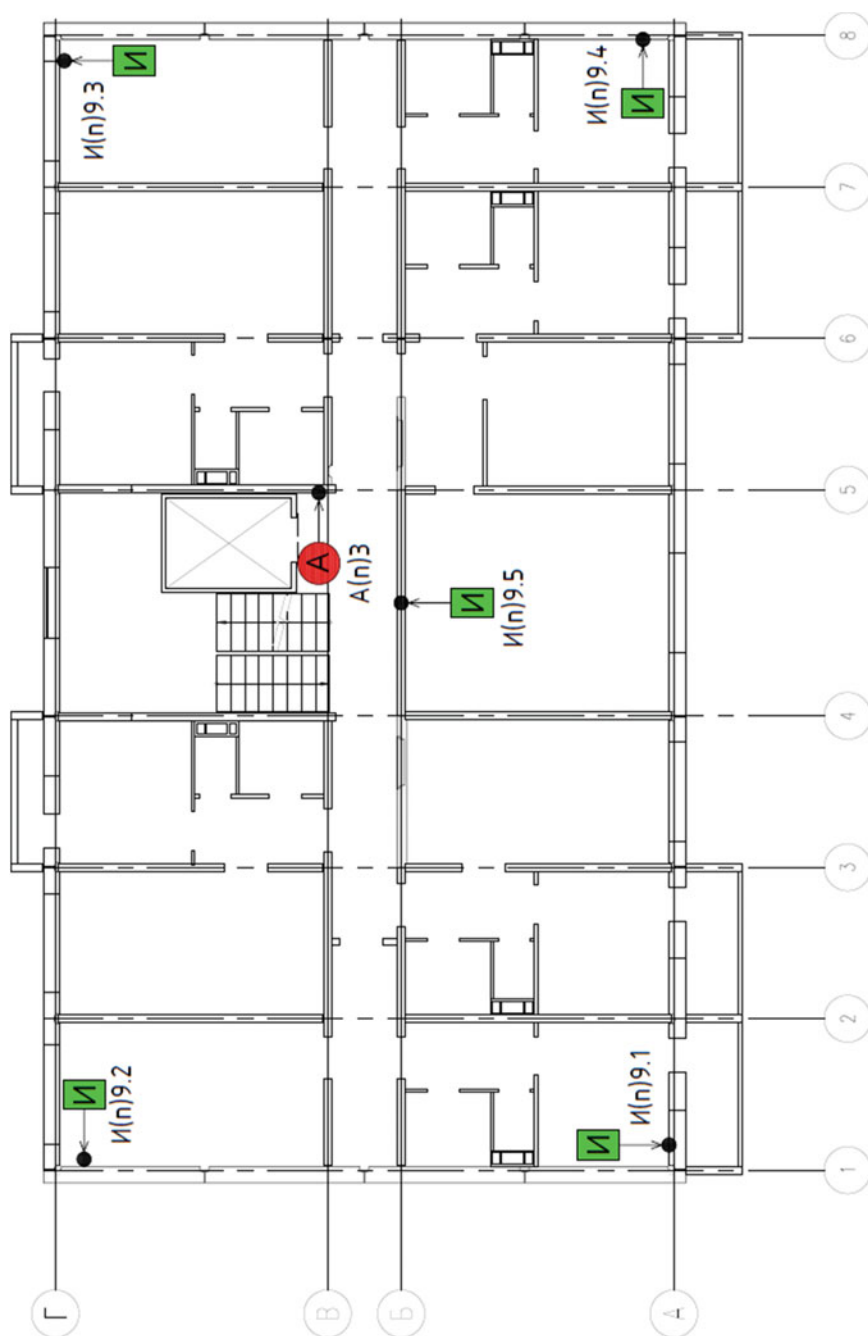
Layout of monitoring sensors at elev. +21,440 panel building
